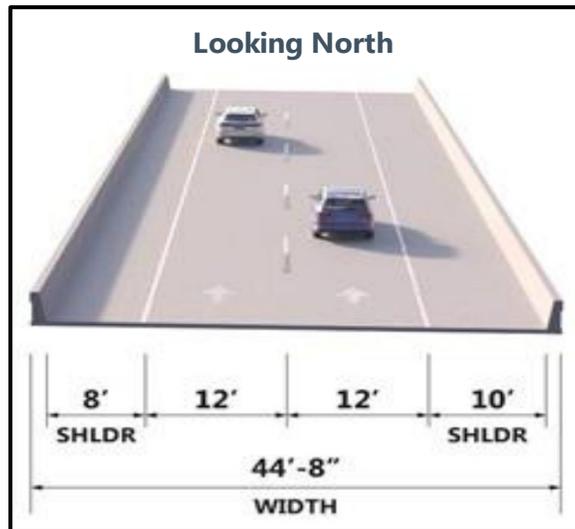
Proposed U.S. 41 Bridge Typical Section.
